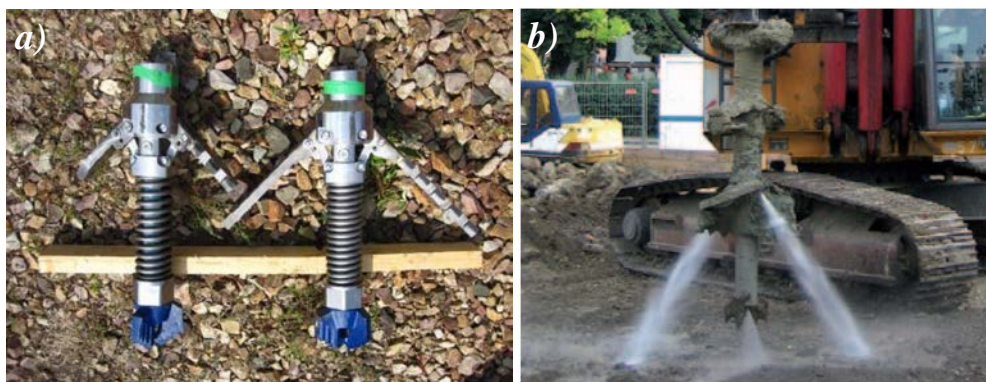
Examples of simple rotary tools. Augers used to wet mixing: a) Springsol® by Soletanche Bachy (Guimond-Barrett, et al., 2012), b) DSM rotary tool by Keller (KELLER, 2013)
